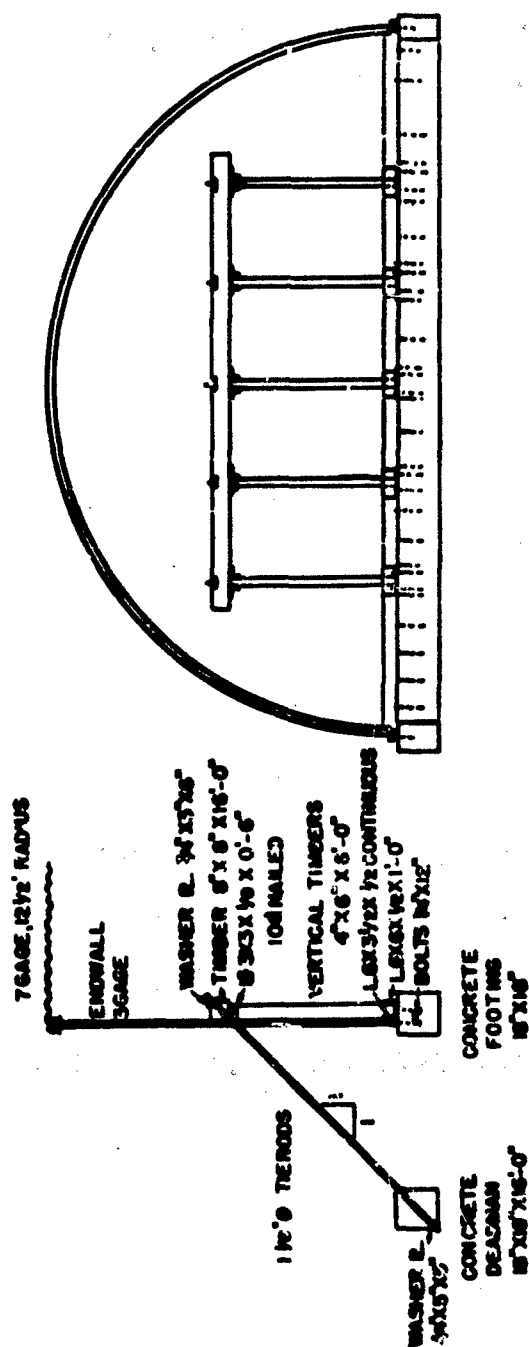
Structure and deadman-supported end wall, structures up to 12 1/2-foot radius. Stock parts for Navy stock 12 1/2-foot radius ammunition storage magazine; end wall, frame, and deadman.
